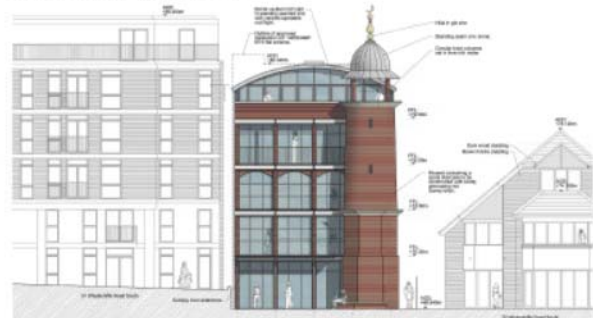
Proposed front elevation in comparison to previous planning permission (LBC Ref 14/05046/P)
